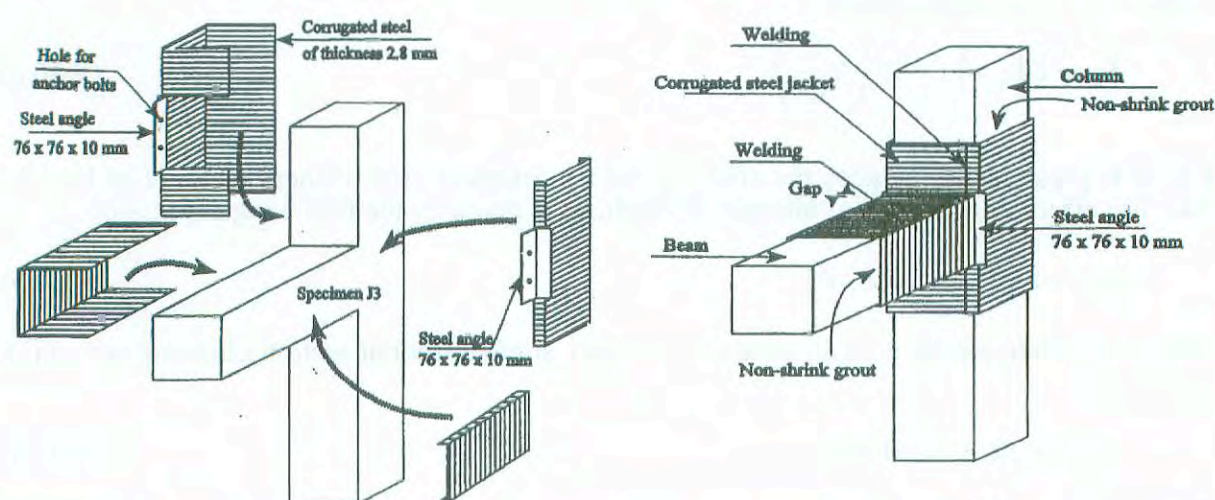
Corrugated steel jacketing of beam-column connection: (a) proposed assembly; (b) assembled jacket (Ghobarah et al 1997).
